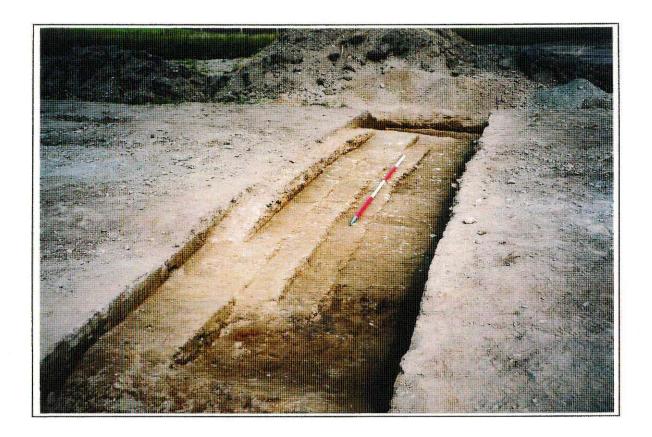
Earliest road surface (22) also showing intermediate surfaces and section of earlier ditch (16). Photo CPAT 1418.13
